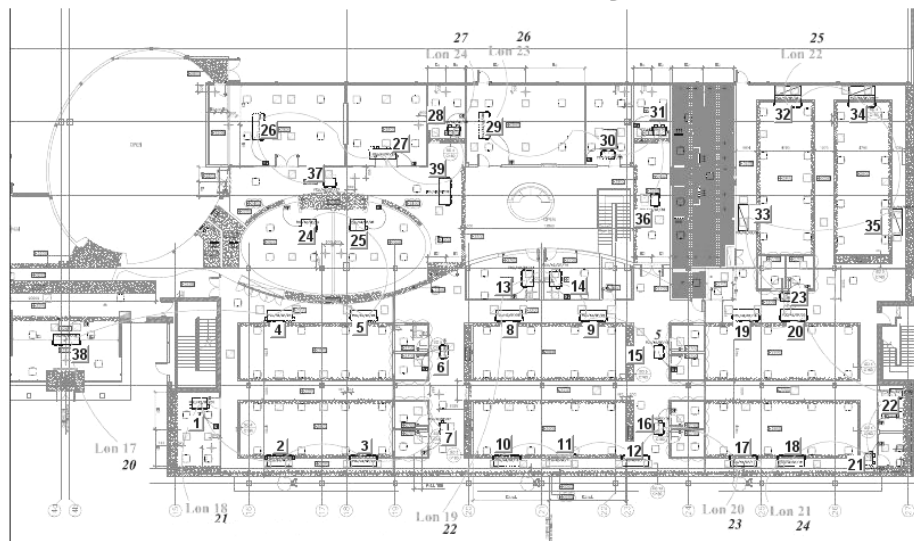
Ground Floor Fan Coil Unit Spatial Floor Plan : U1 to U33
